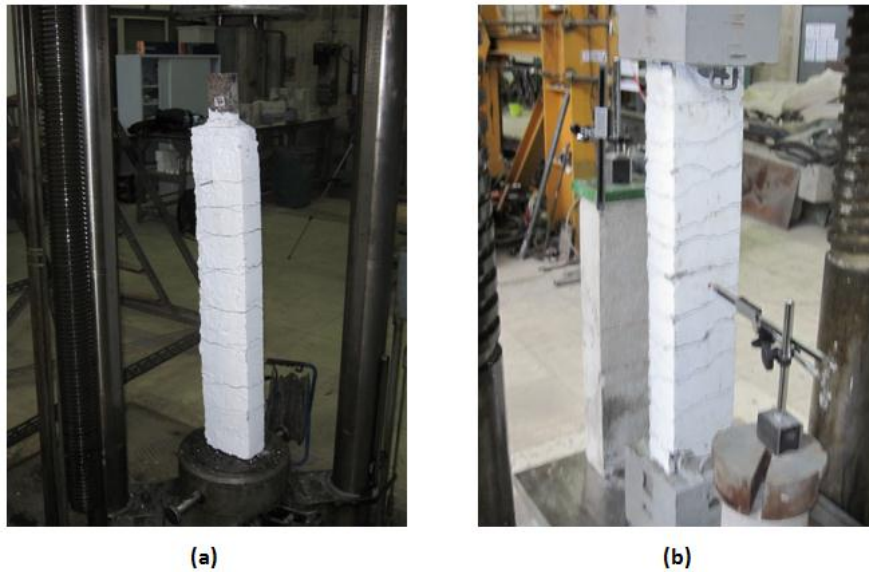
Test setup for application of: (a) Tensile loading, (b) Compressive loading
